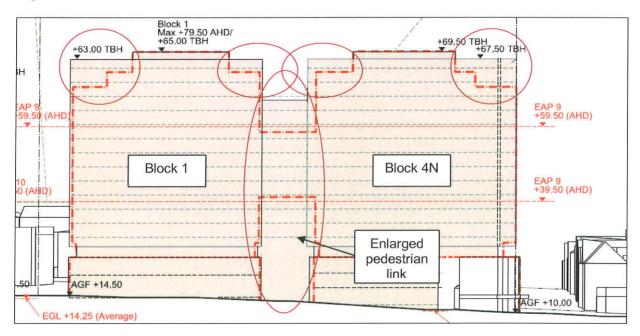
Proposed Broadway elevation looking south illustrating increased building envelope area compared to approved envelope dotted red (Source: Proponent's application)
